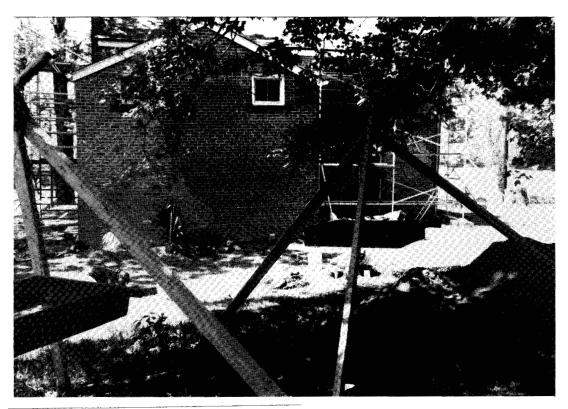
East (rear) elevation of the Frazee-Hynton House.
